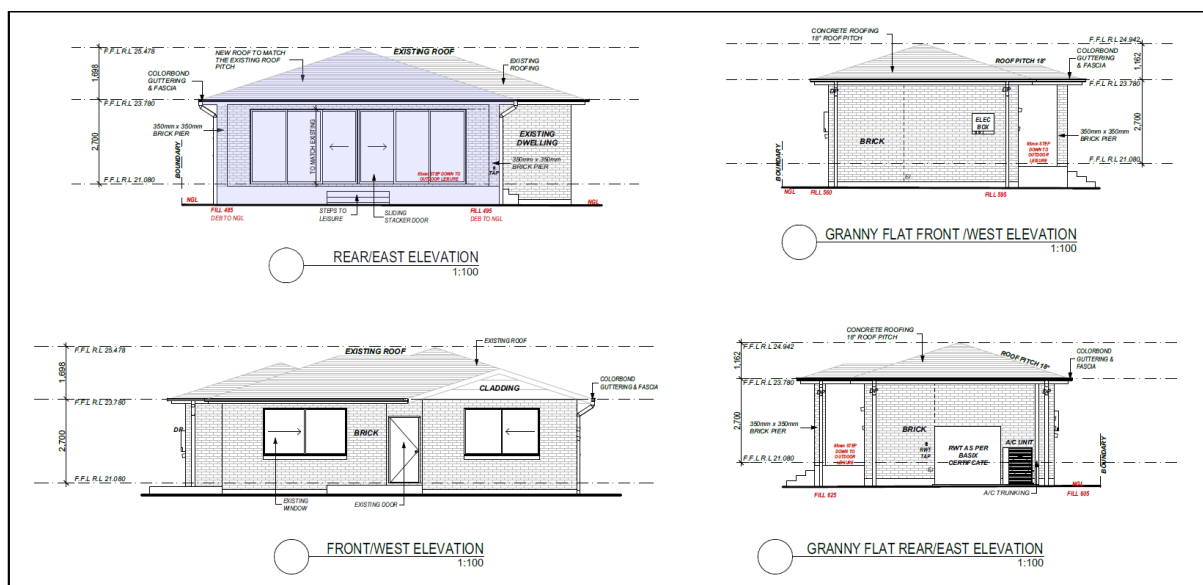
Proposed east/west elevations - principal dwelling (left); secondary dwelling (right)
